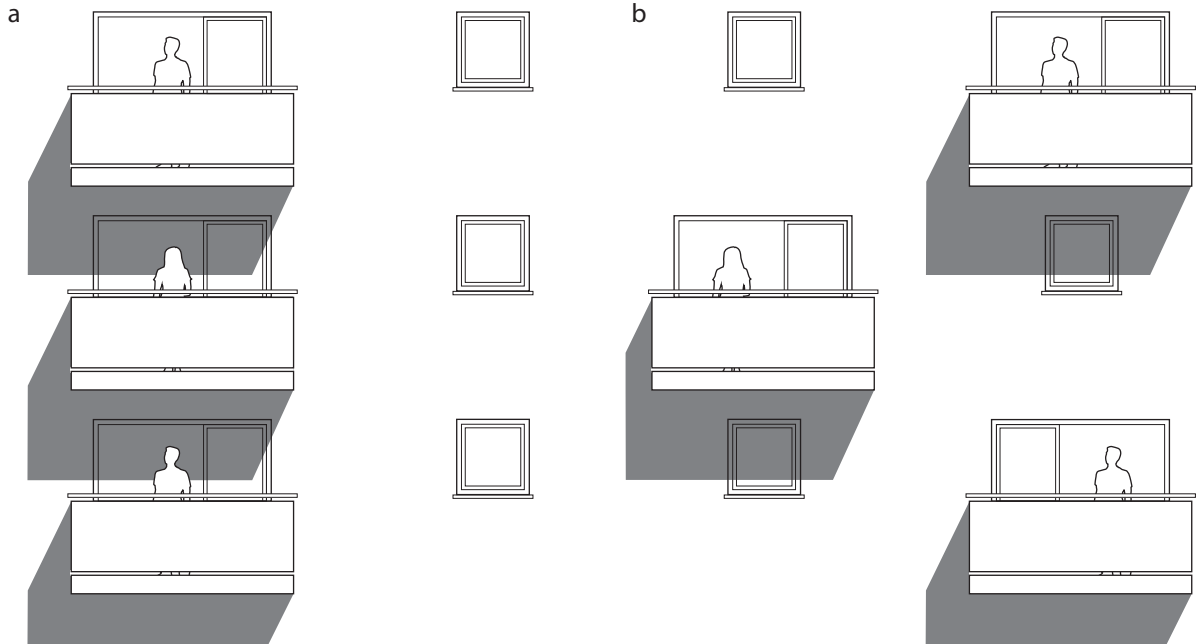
In a conventional layout (a) the balcony above each living room reduces the daylight it receives. Staggered balconies (elevation b) give improved daylight and sunlight to living rooms.
